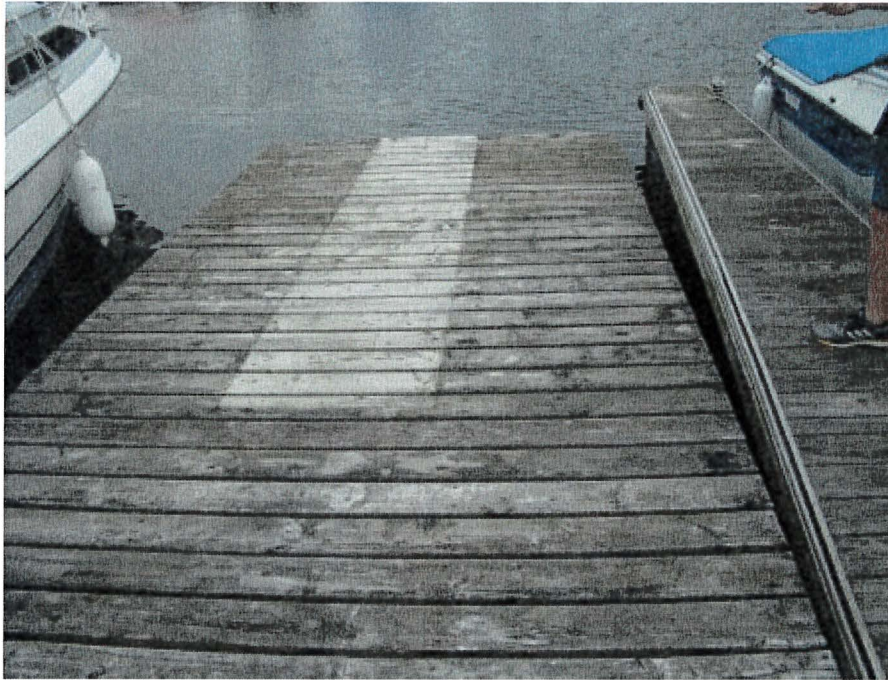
West Main – Dock B. Pile 15. Steel Wire instead of Pile Guide.
